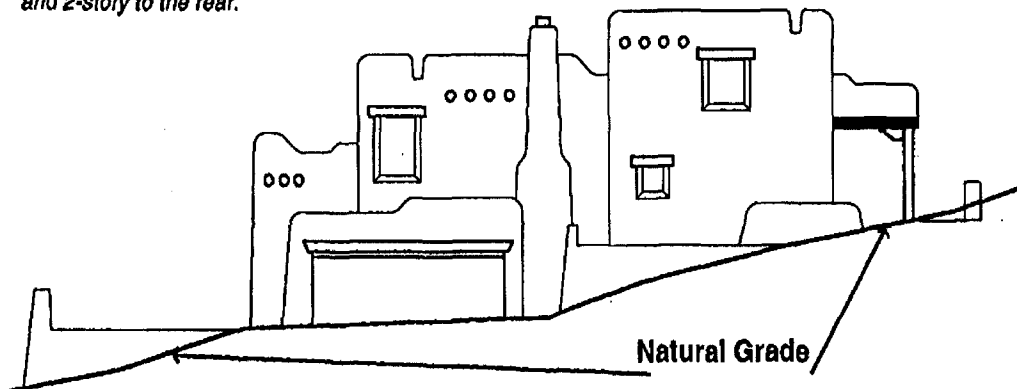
Elevation of 2-story home with lower level sited into natural grade
